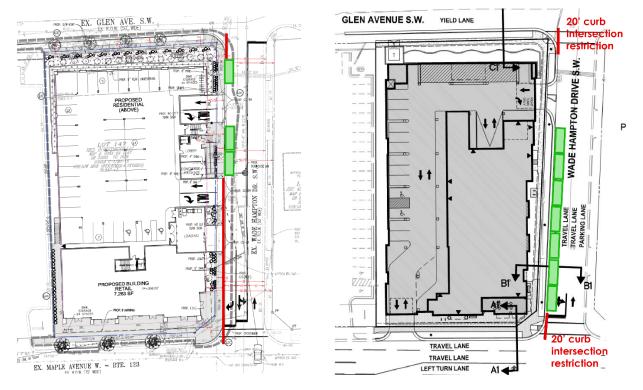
Available on-street parking on Wade Hampton Dr SW per approved concept plan (left) and proposed concept plan (right)
